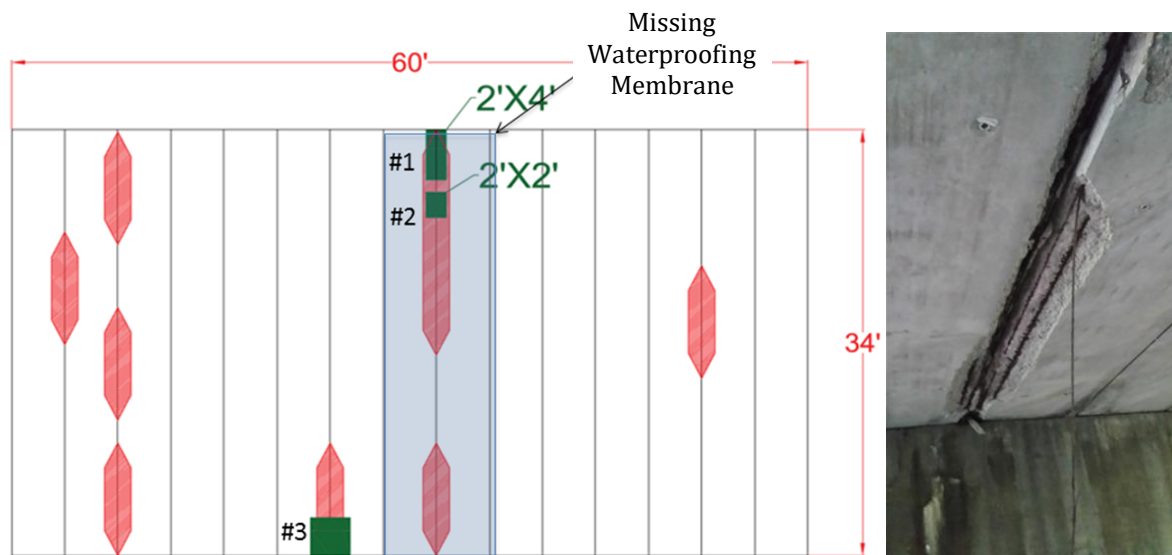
Corrosion Damage on the Underside of Box Beams
